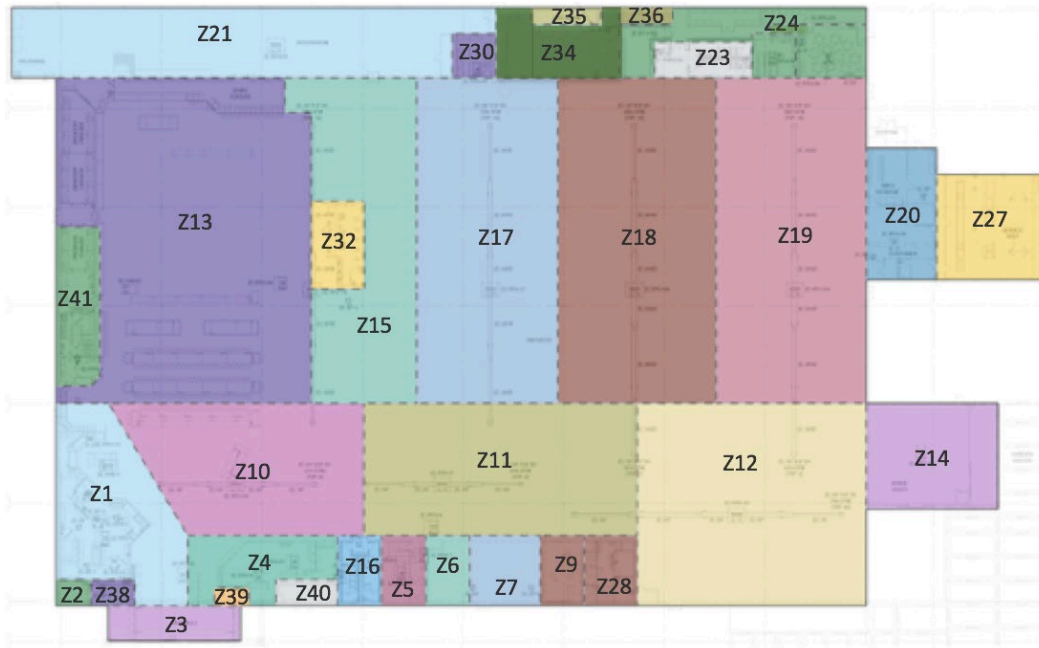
Zoned Walmart store based on an overlay of mechanical and site floor plan drawings
